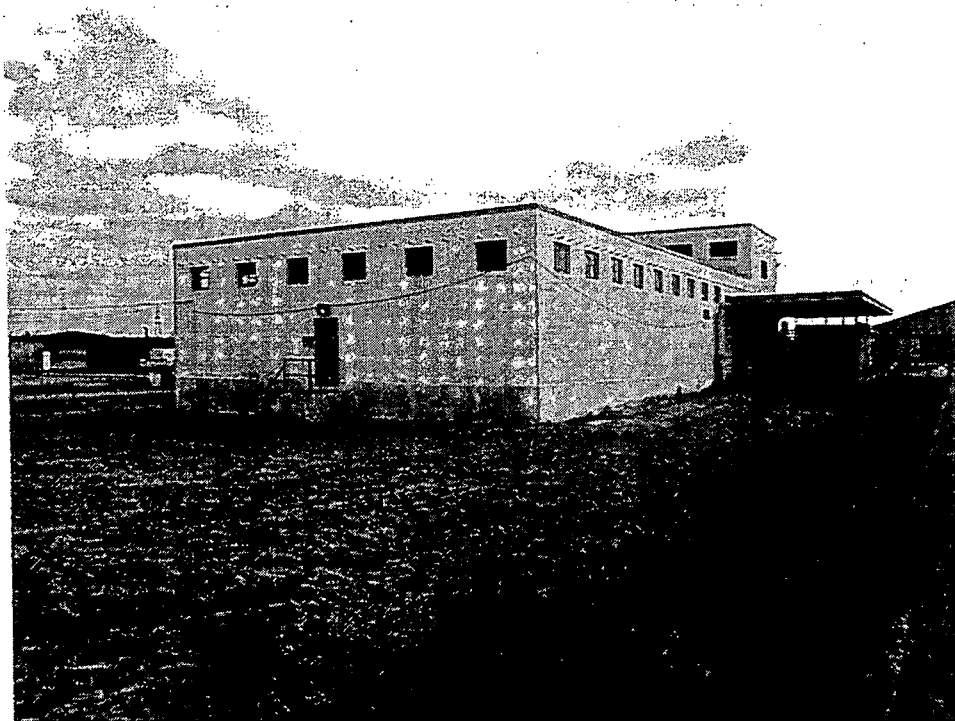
Building 32A and 32B - Northwest Elevation
